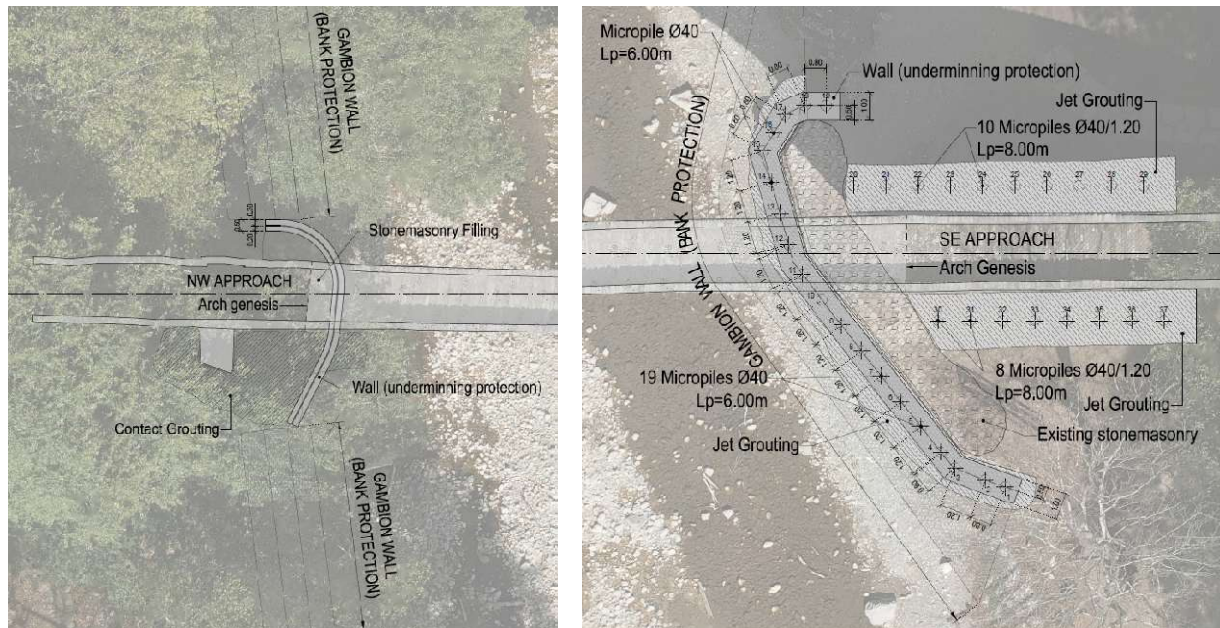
Plan view of the proposed geotechnical measures a) at the northeast abutment and b) at the southwest of the Pyli Bridge.
